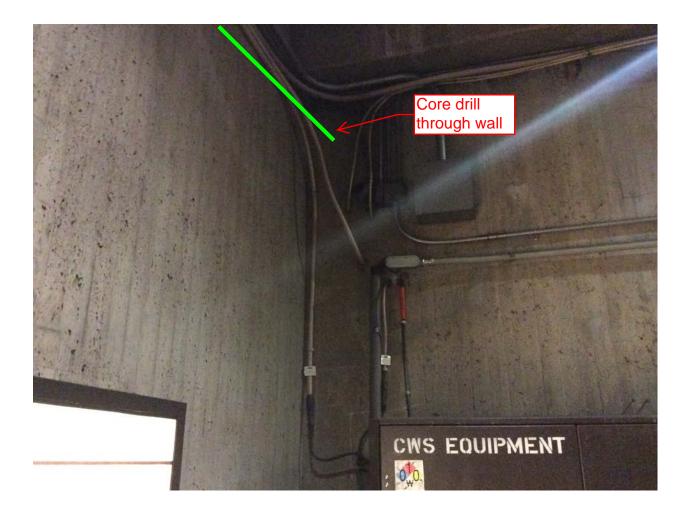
Proposed conduit run along wall inside Mechanical Room 214 (core drilll required)
